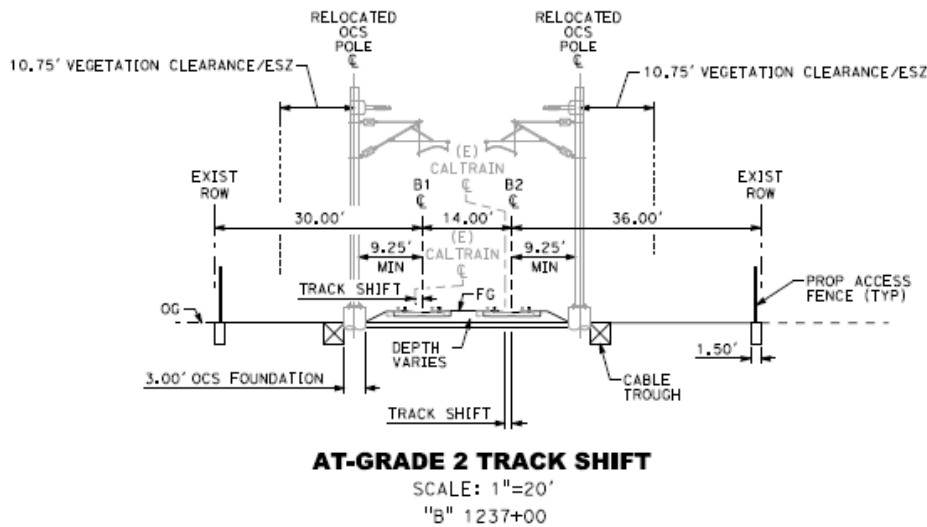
Typical Section - San Bruno to San Mateo Subsection Alternative A
